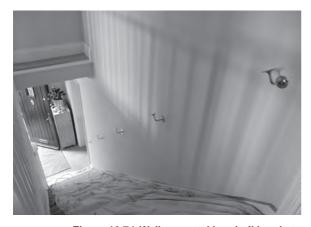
Wall-mounted handrail brackets should be spaced at no more than 1 m apart.
